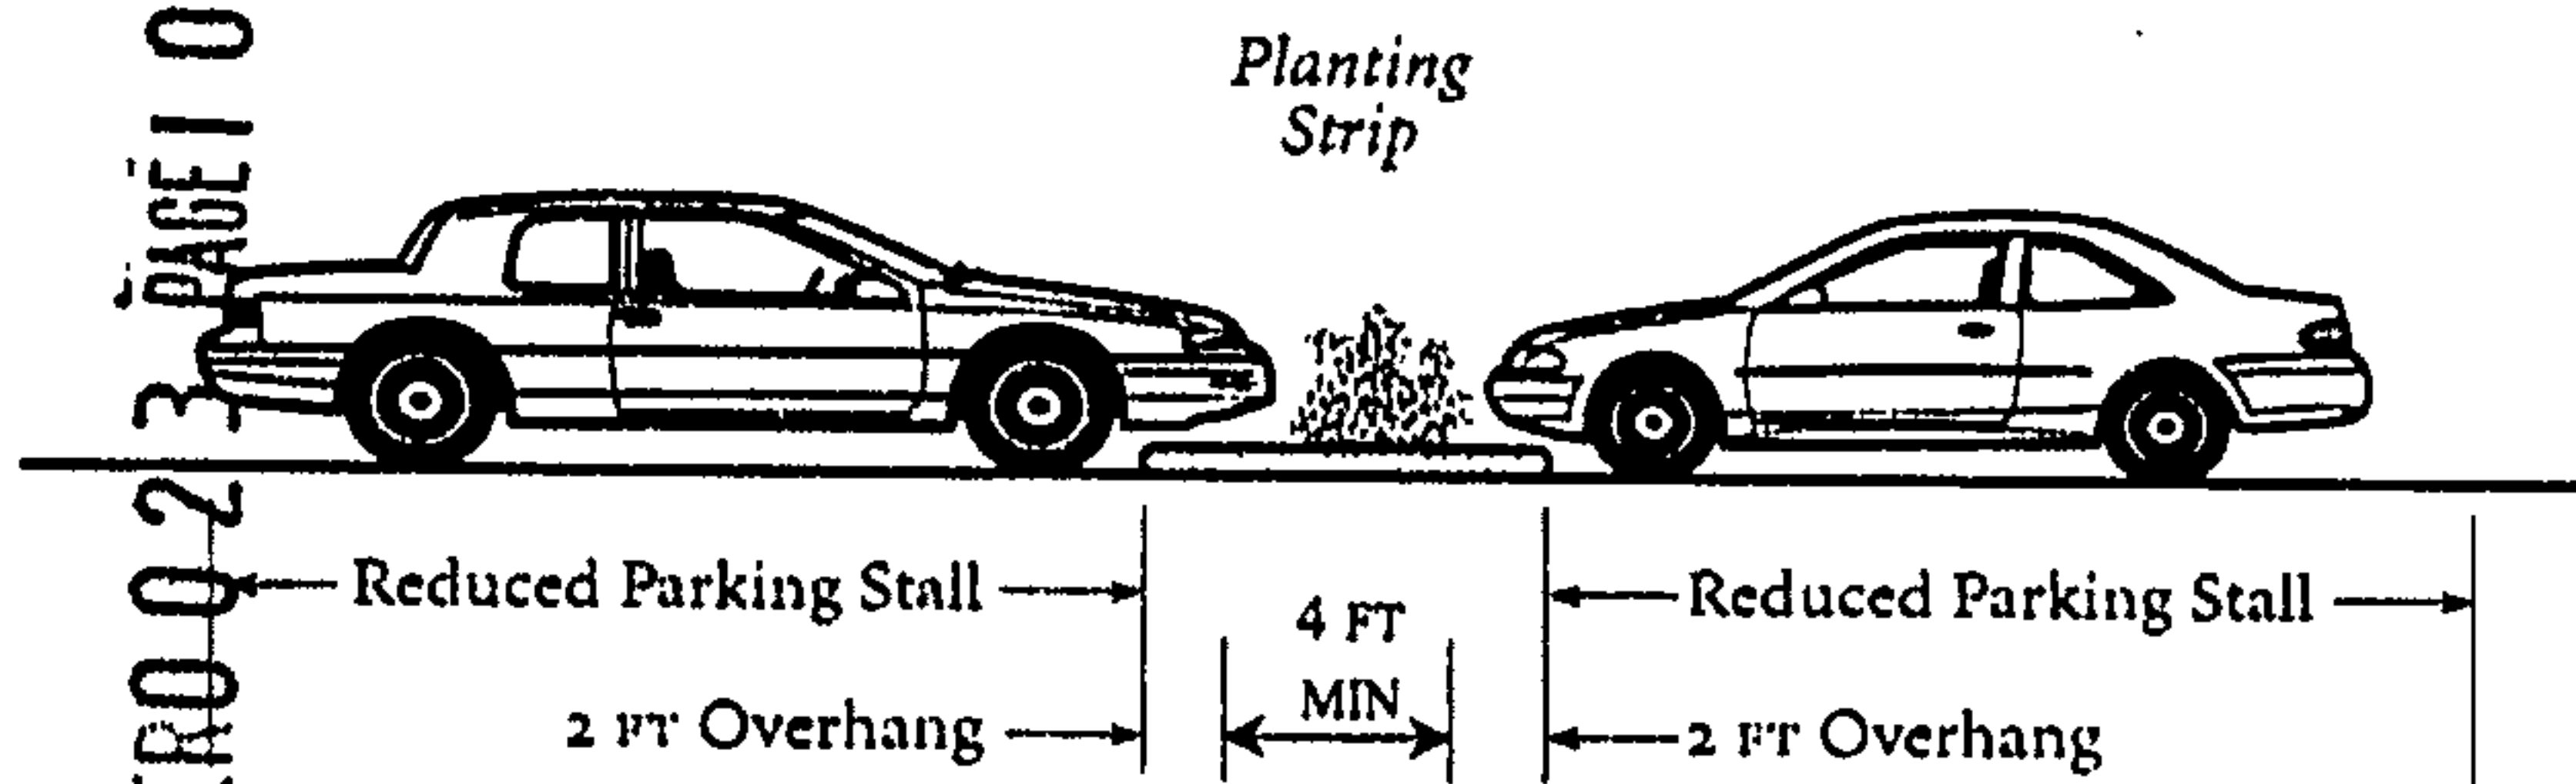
OVERHANG ALLOWANCE, REDUCED PARKING STALLS
